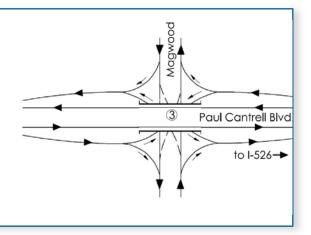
Paul Cantrell Boulevard at Magwood Drive Alternative 3
